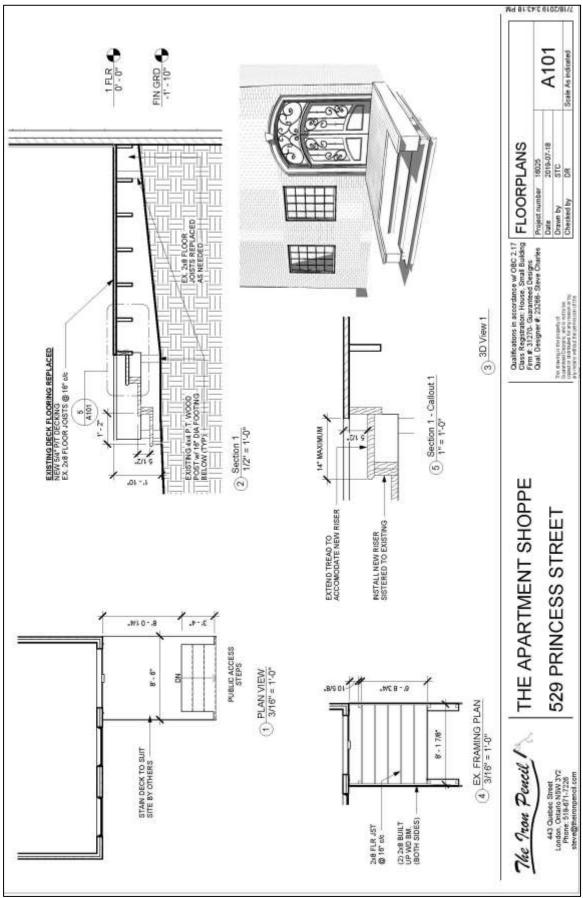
Drawing showing the existing porch of the dwelling at 529 Princess Avenue. Note the door and windows are not accurately depicted.
